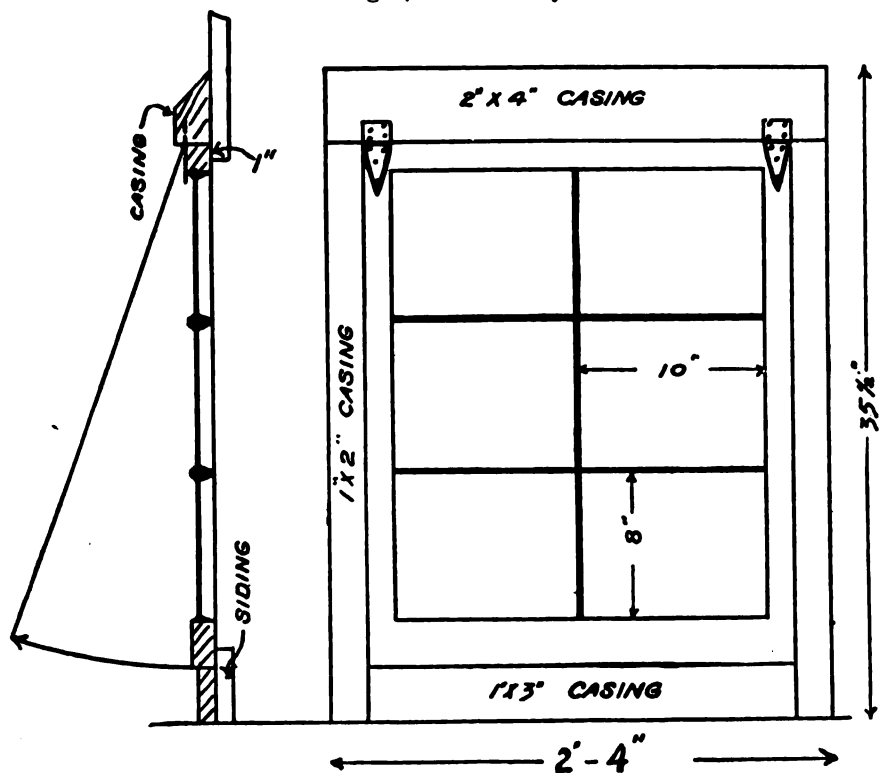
Detail of the window, showing cross-section and front views. Note the bevel of the 2x4-inch top casing
